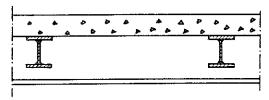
Floor structure, composed of a reinforced concrete slab, load-bearing steel beams, and an insulating ceiling
